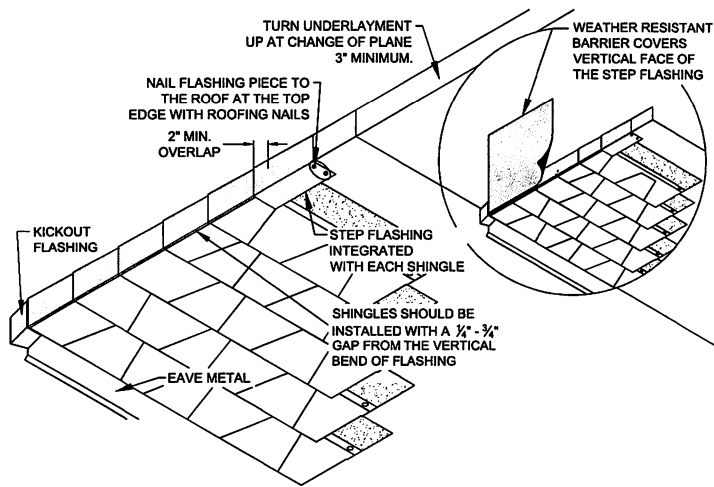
Step Flashing Application at Roof-to-Sidewall Transitions
